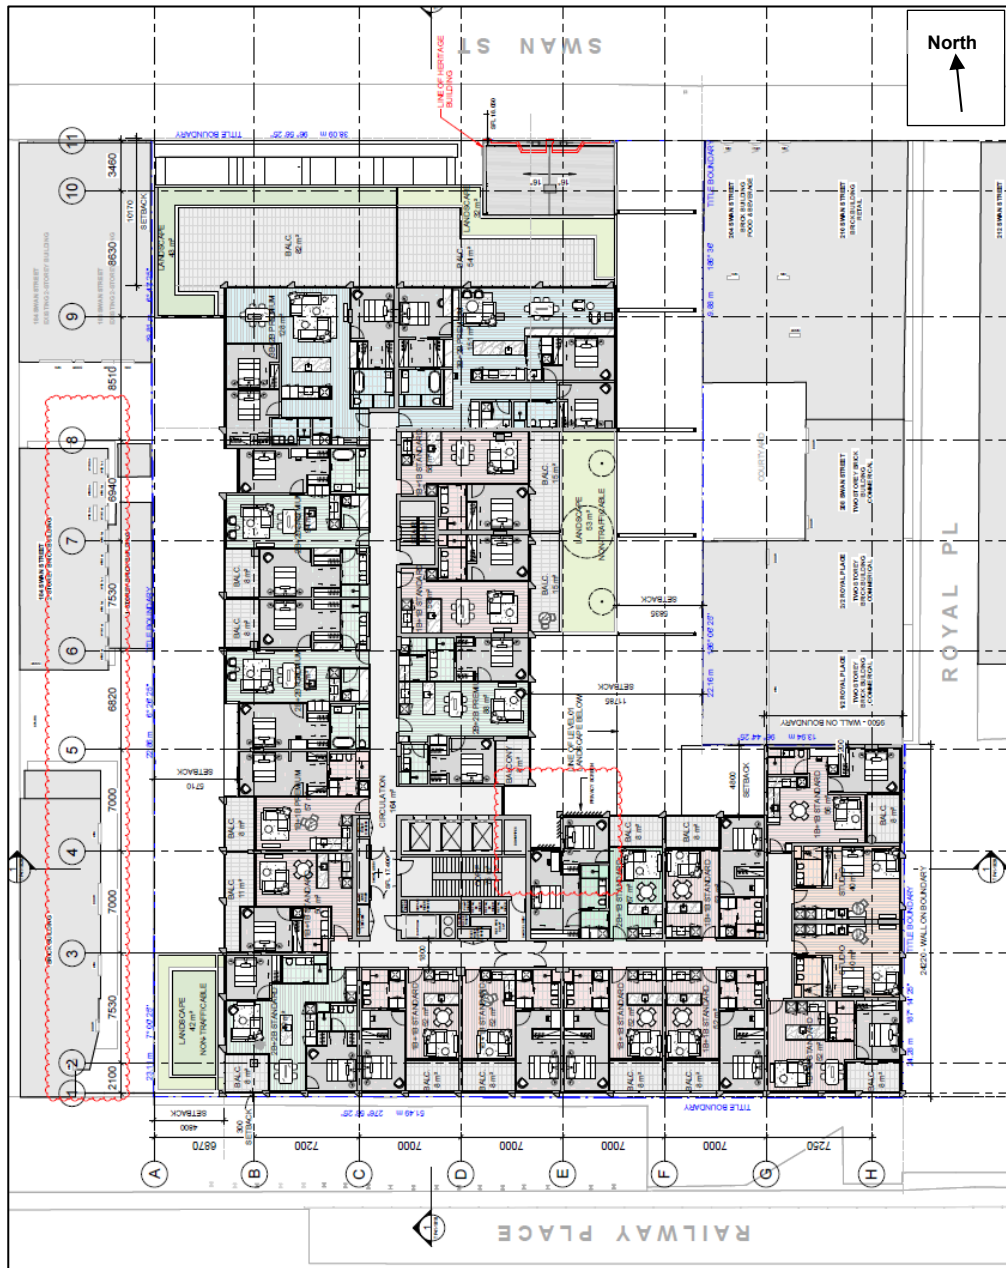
Level 2 floor plan of the proposed 188-202 Swan Street Development.
